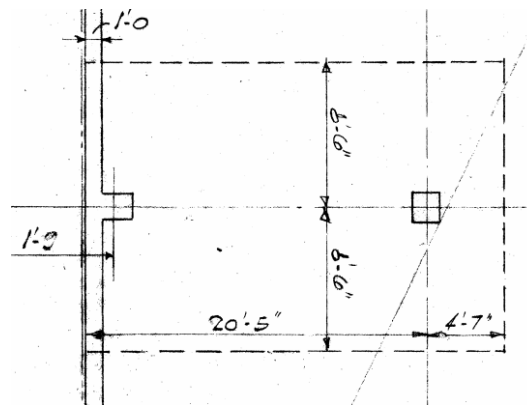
Typical Combined Footing Shown Dashed in Plan, from S1
